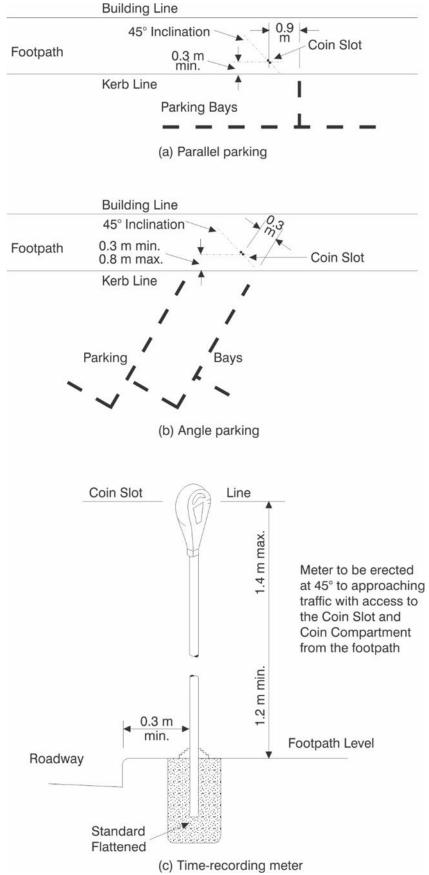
(a) – Erection of parking meters for parallel and angle parking: Typical arrangement
